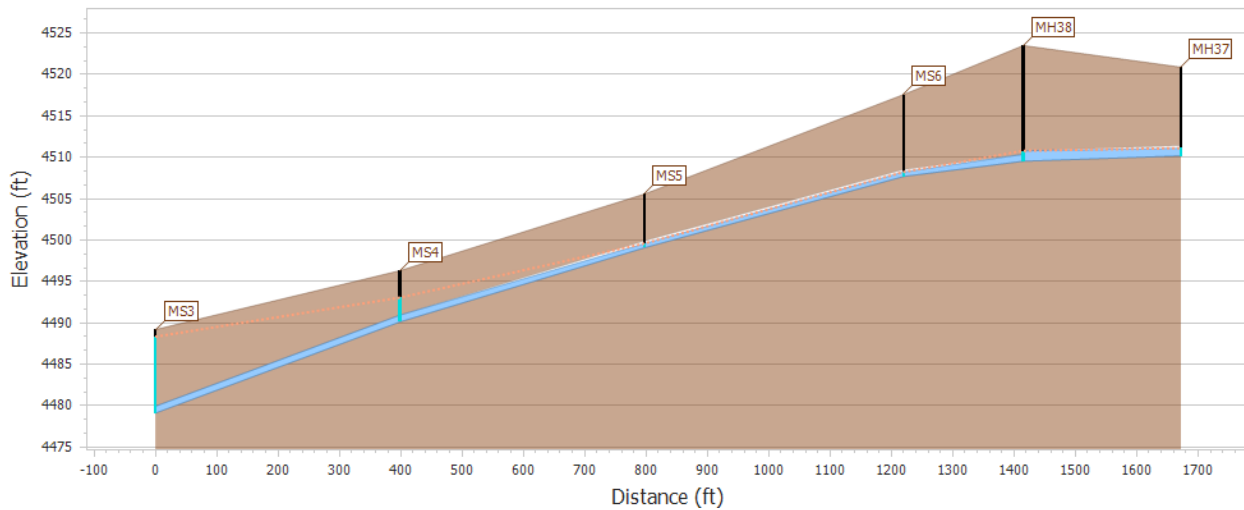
Main Street Trunk Phase 2 – Master Plan HGL
